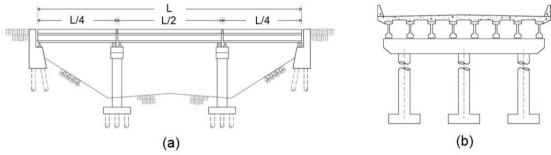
(a) The general overview of the MSSS concrete highway bridge (b) Configuration of the MCSS with girders and deck over the beam (not to scale)
